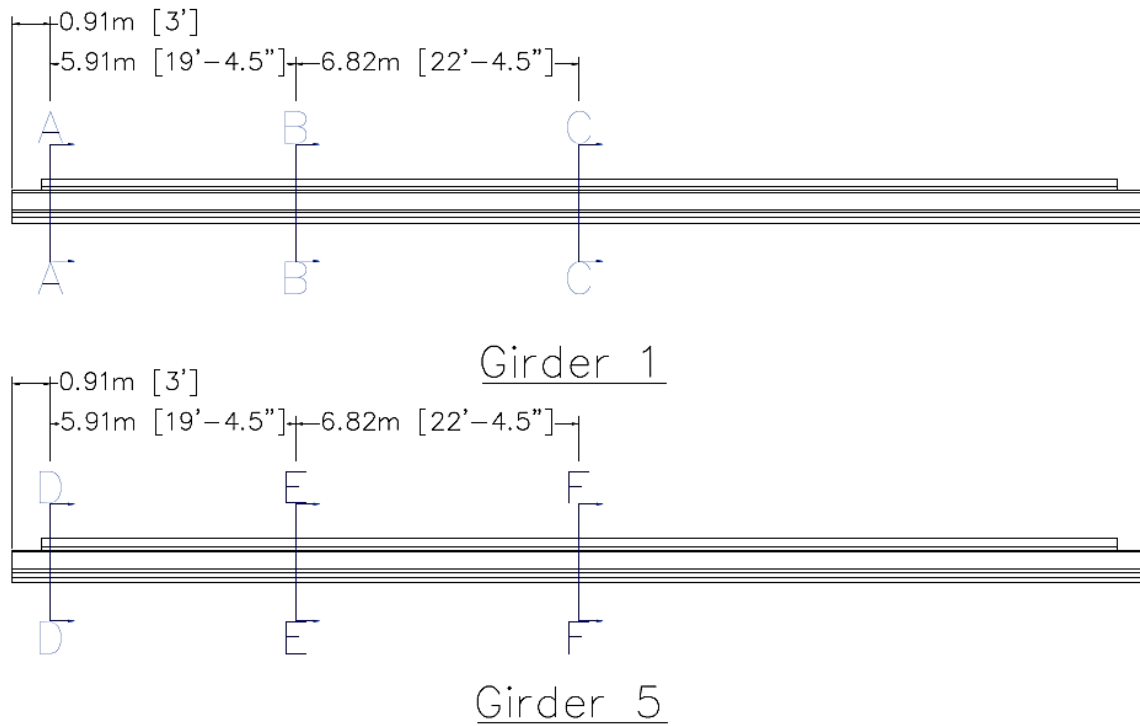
Girder 1 and Girder 5 Section Cut Locations
